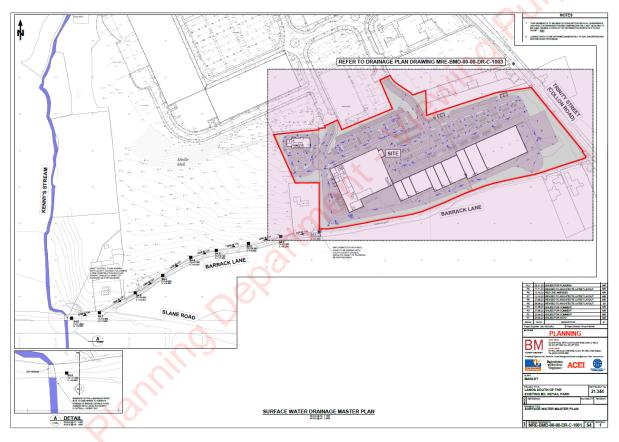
Surface Water Master Drainage Plan (Drawing Ref. MRE-BMD-00-00-DR-C-1001; Barrett Mahoney, 2022)
